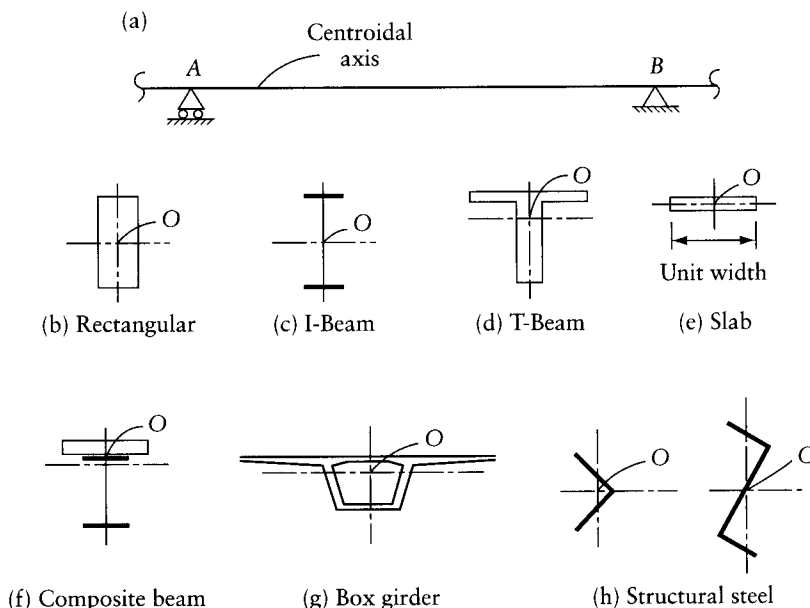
Beam idealization. (a) Interior span of a continuous beam. (b) to (h) Possible cross sections.
